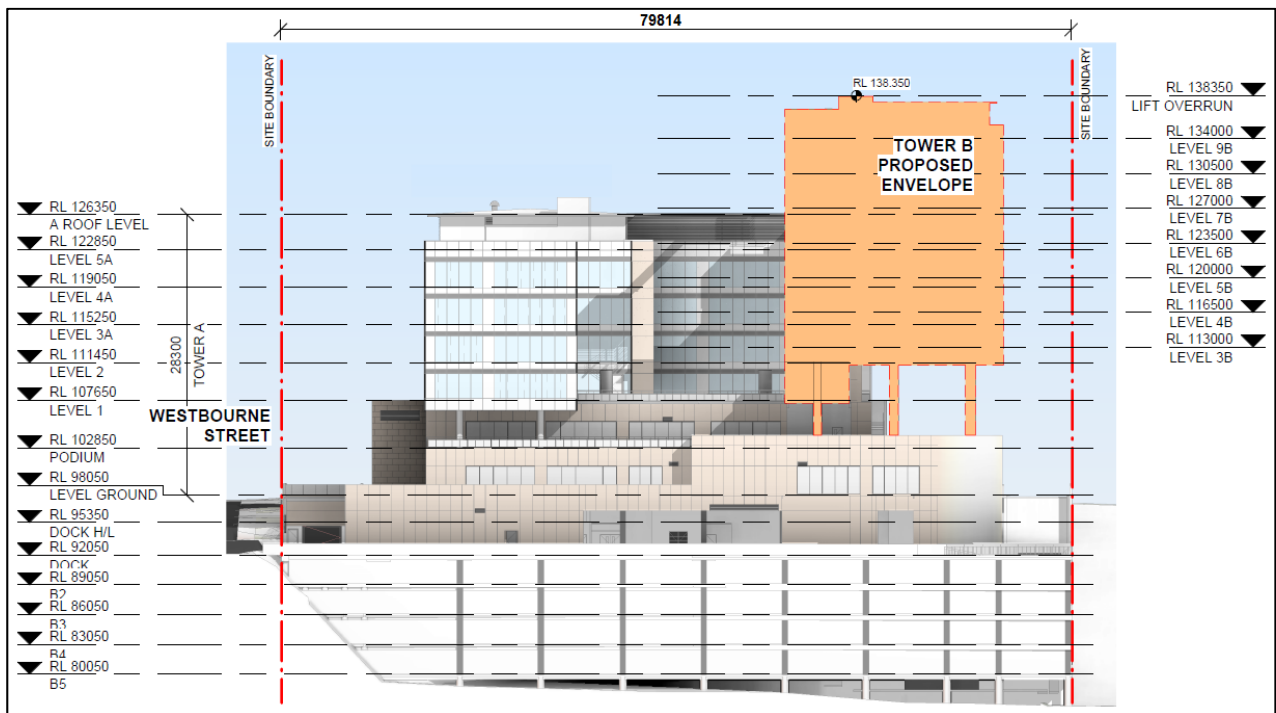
North-east elevation (Source: Tower B concept RtS Addendum)
